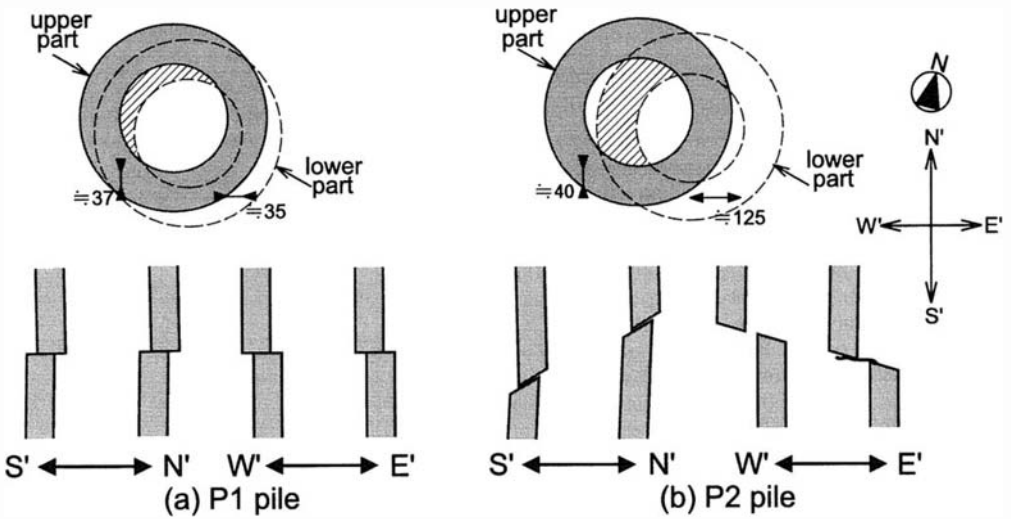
Marked lateral gaps and vertical section of the piles (unit:mm)
